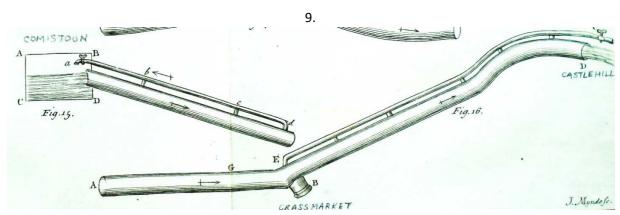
Desaguliers' improvement 1721, showing pipeline ends + air removal-riders and cleansing cock
